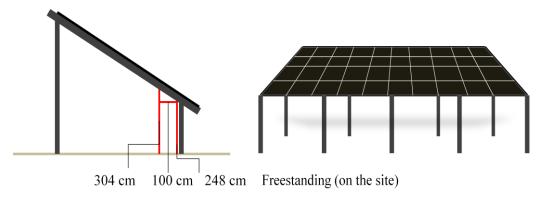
South-West Elevation and South-East Elevation of the Array (Drawn by author)
